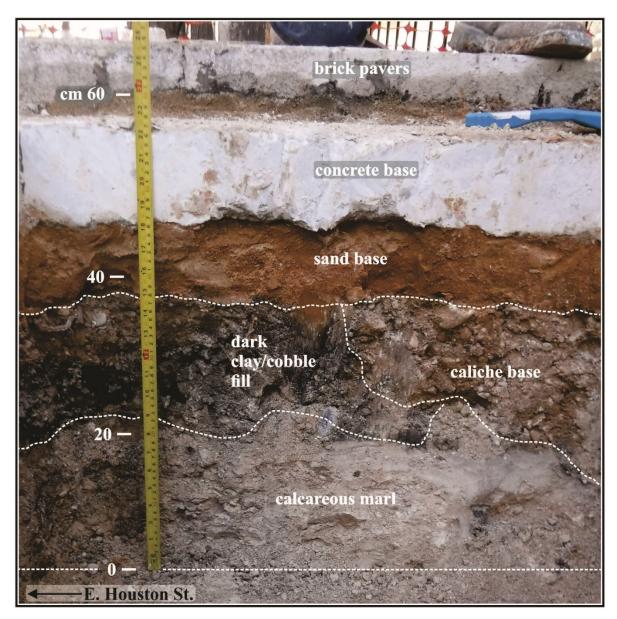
Excavation for Kiosk 3 foundation, east wall profile; note how shallow the marl is in this area.
